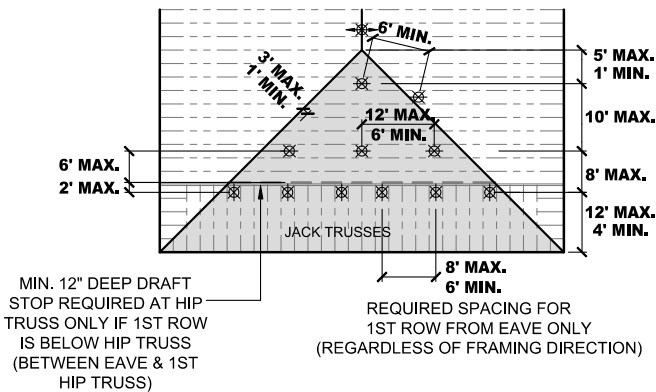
A: HIP LAYOUT CRITERIA WHEN FIRST ROW OF SPRINKLERS PLACED "WITHIN" JACK TRUSSES
